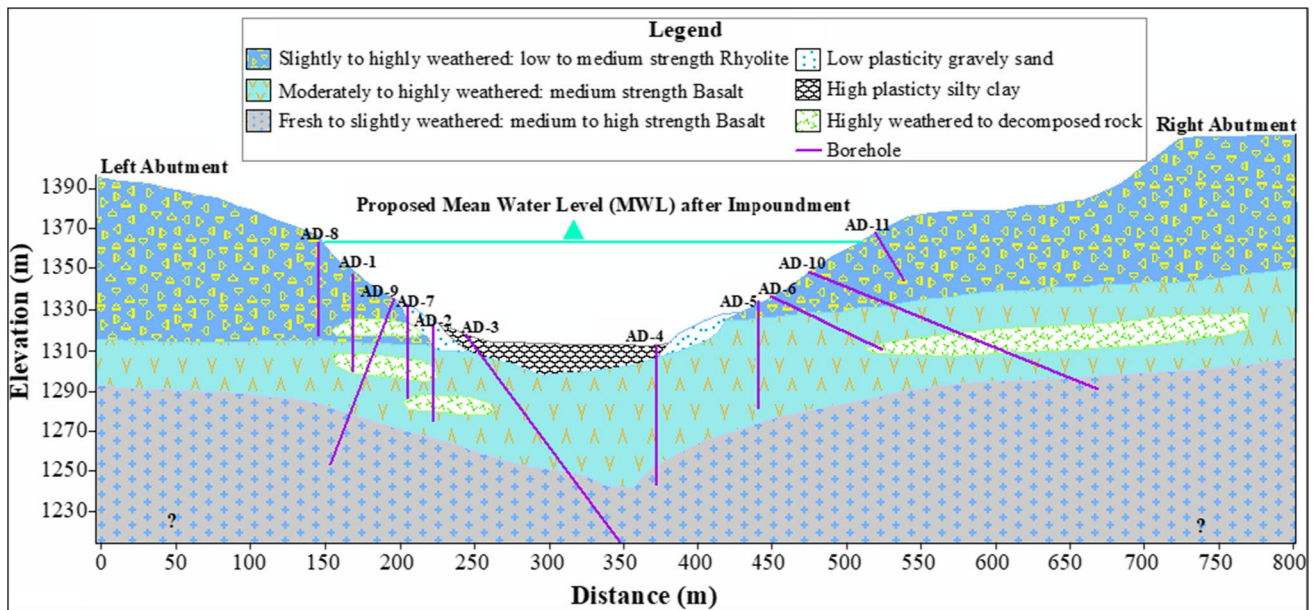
Engineering geological cross-section of the Arjo Didesa dam site
